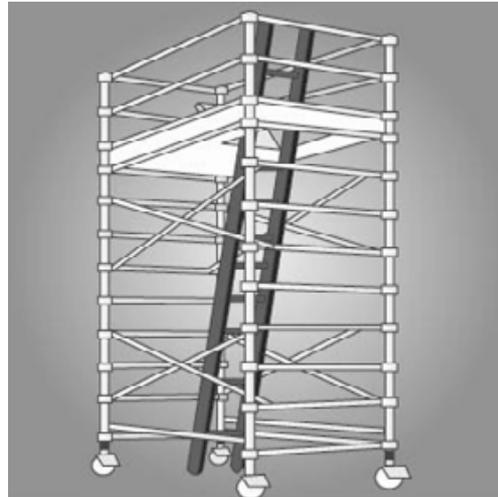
Mobile scaffold with an access ladder and trapdoor to provide the largest possible hazard-free working platform.
